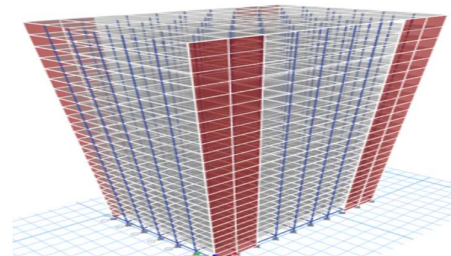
3D View of Bare frame model having shear wall along X-direction
